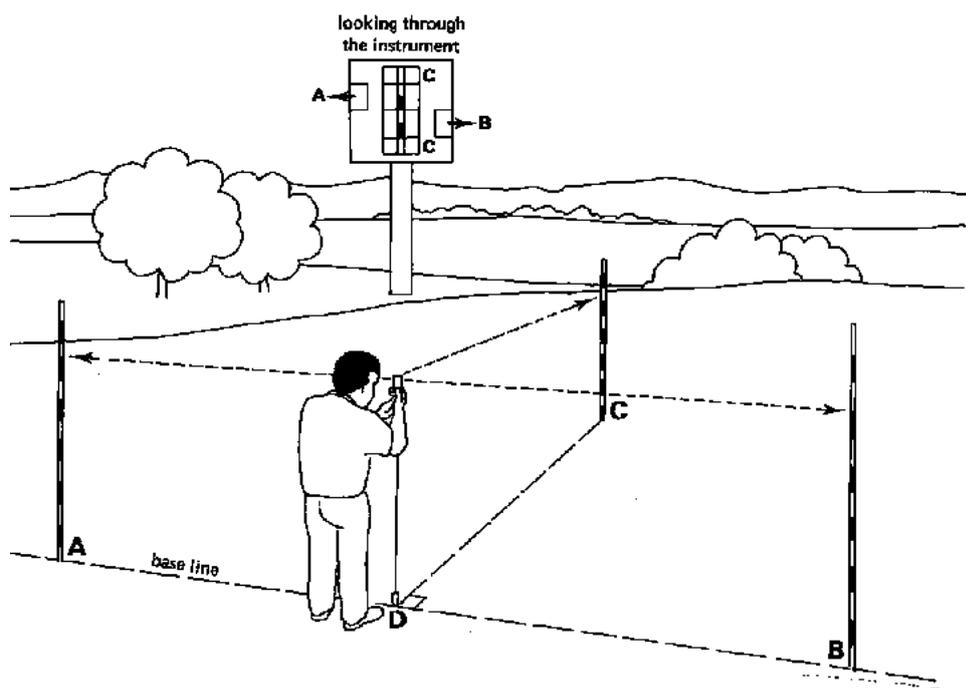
Setting out a perpendicular line, Step 1](#)
